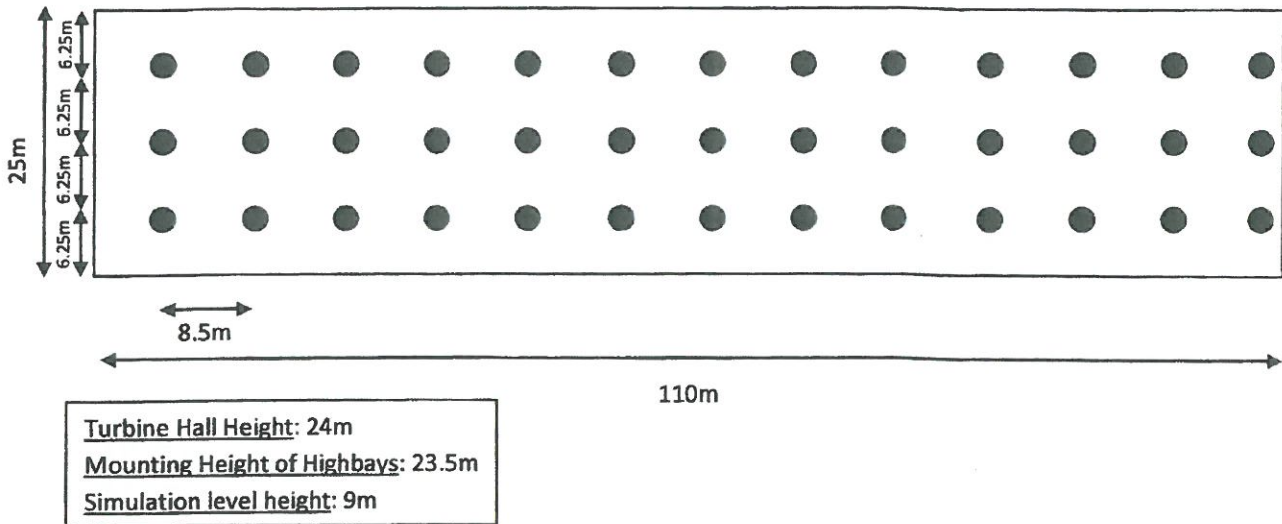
Schematic Diagram of Medupi Unit 6 Turbine Hall – Plan Layout (N.T.S)
